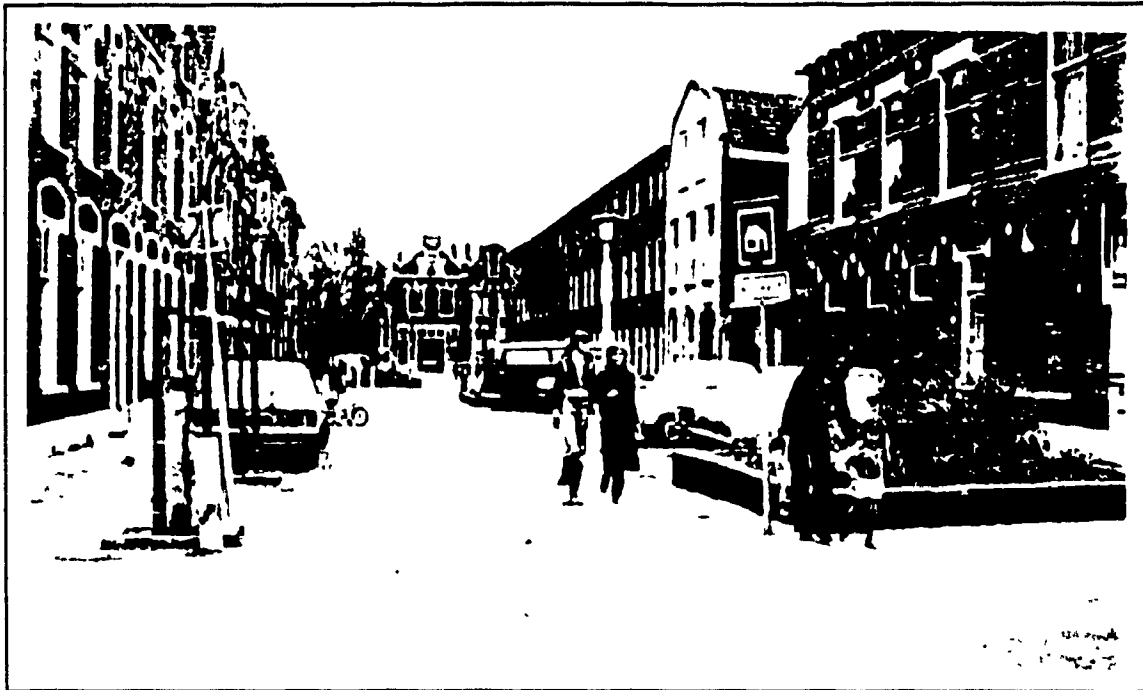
Curb elimination between the side walk and the street pavement (From Woonerf, 1977)
